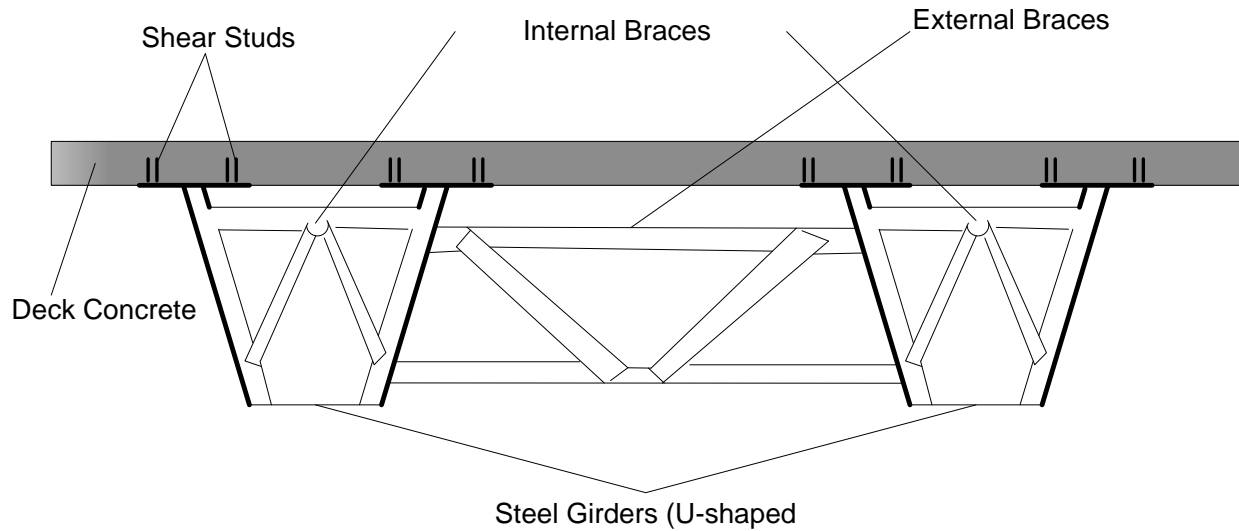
Typical steel concrete composite bridge cross-section [7]
